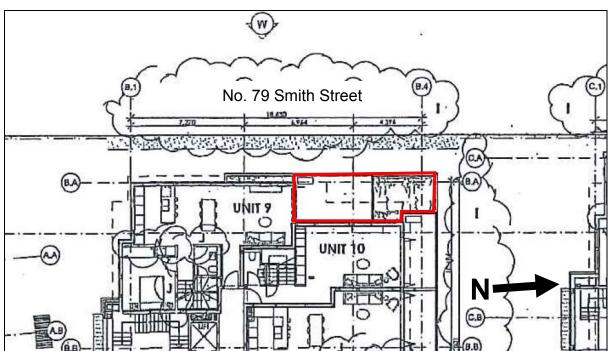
Private open space of Unit 9 Building B. Red line denotes private open space.
